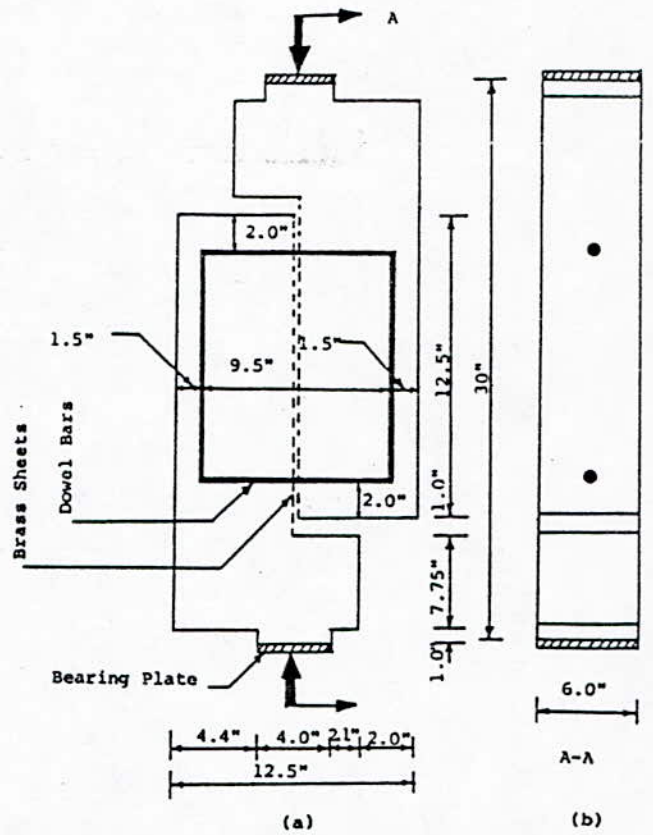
Test specimen: (a) dowel bars, and (b) Section A-A
